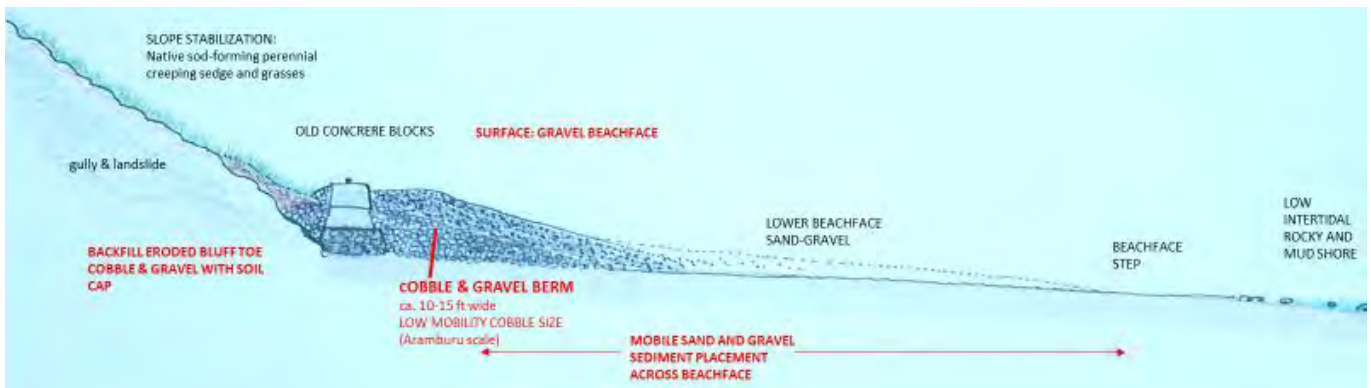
Cross-section conceptual sketch view of cobble-gravel berm between boat ramp and concrete block revetment. No coarse beach sediment is directly placed below the existing beachface.
